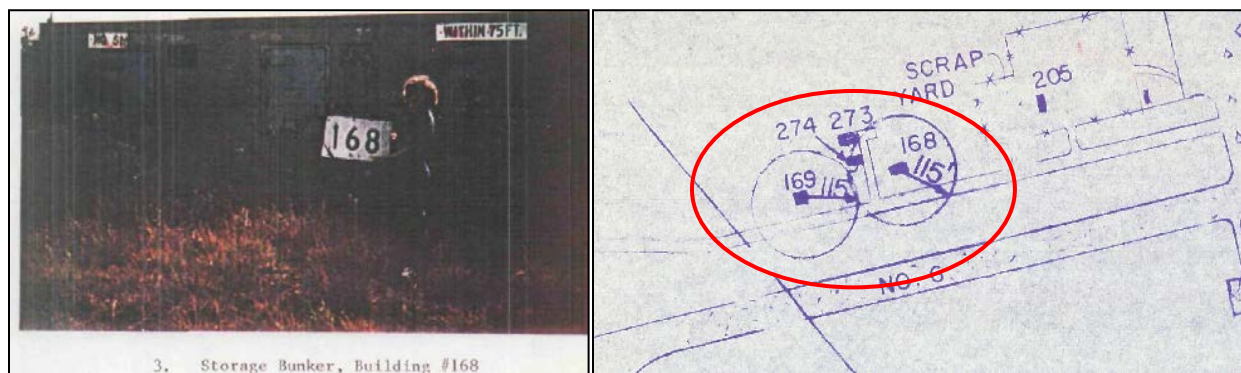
Buildings 168 and 169 Storage Bunker 1968¹²²
